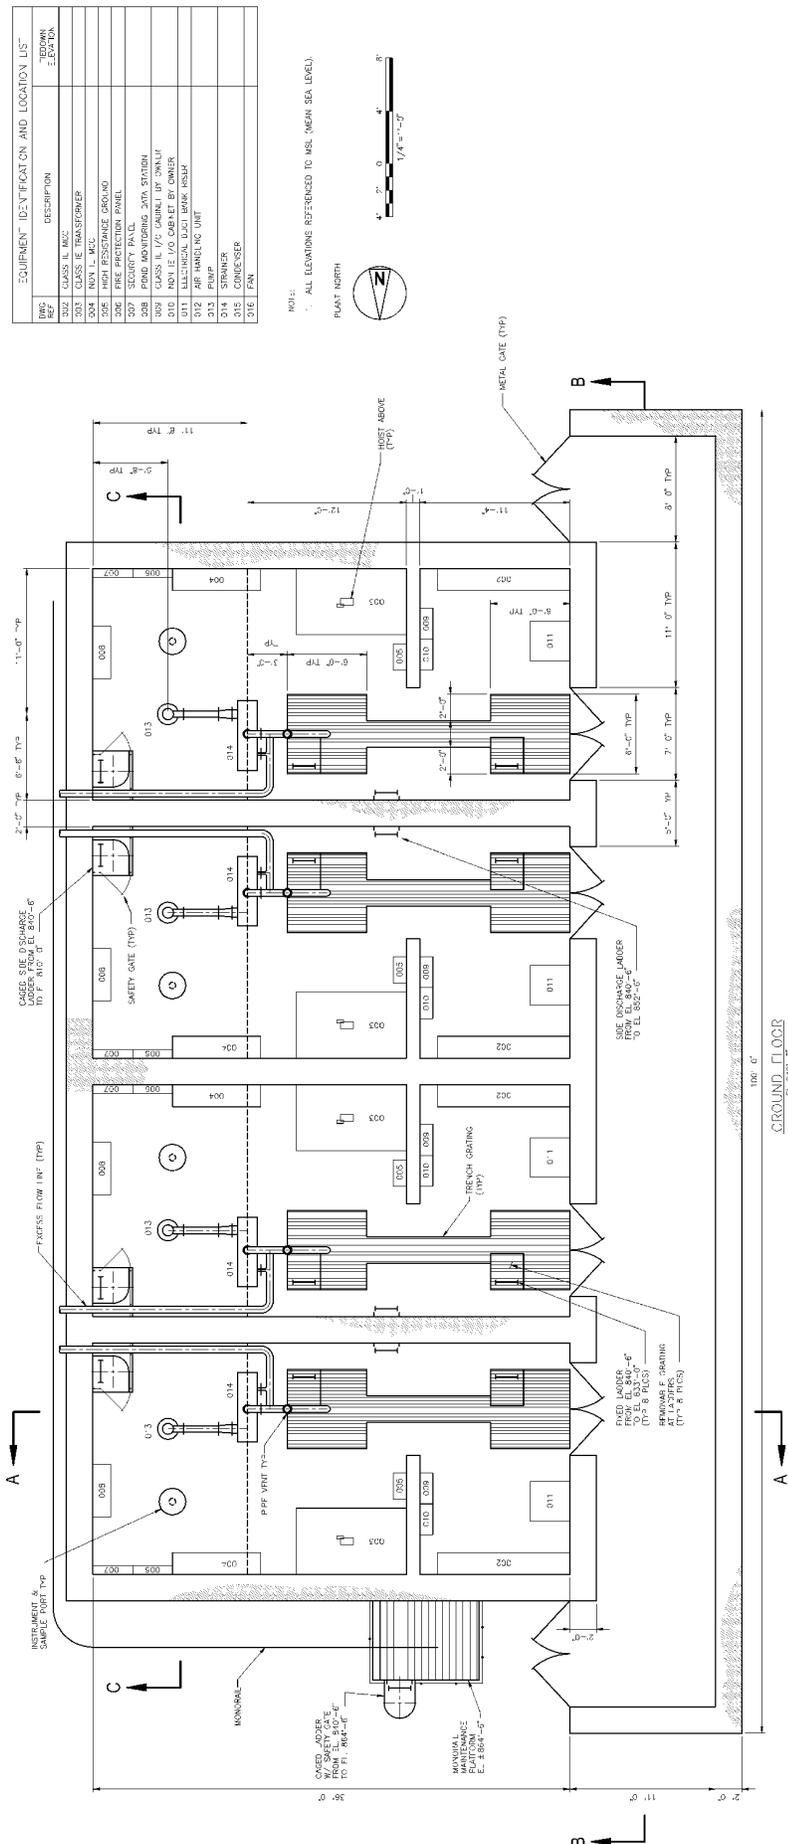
{Plant Arrangement - ESWEMS Pumphouse Section}
